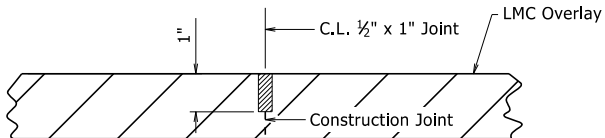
DETAILS OF HYDRODEMOLITION AND LATEX MODIFIED CONCRETE OVERLAY
